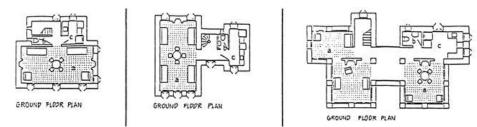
Plan arrangement of the buildings (Khosla, 1992).
